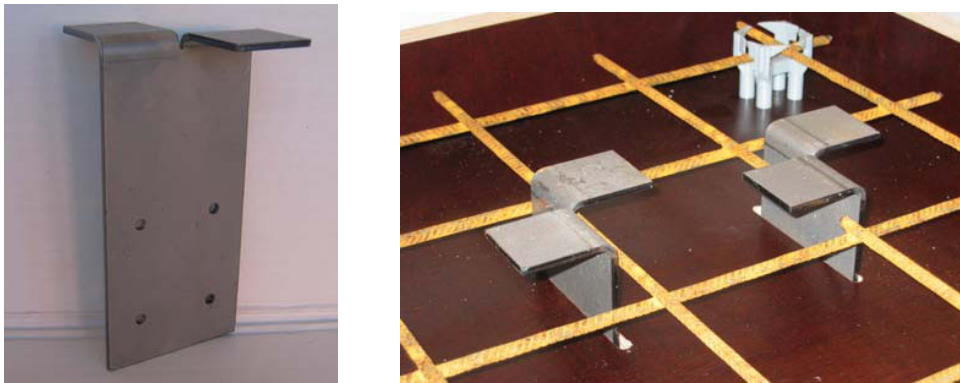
SP+N steel plate shear connector in the moulding form [1].
